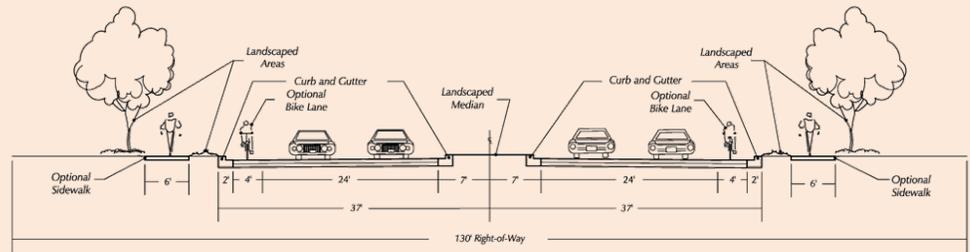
Typical Minor Arterial Cross-Section (With Median)
